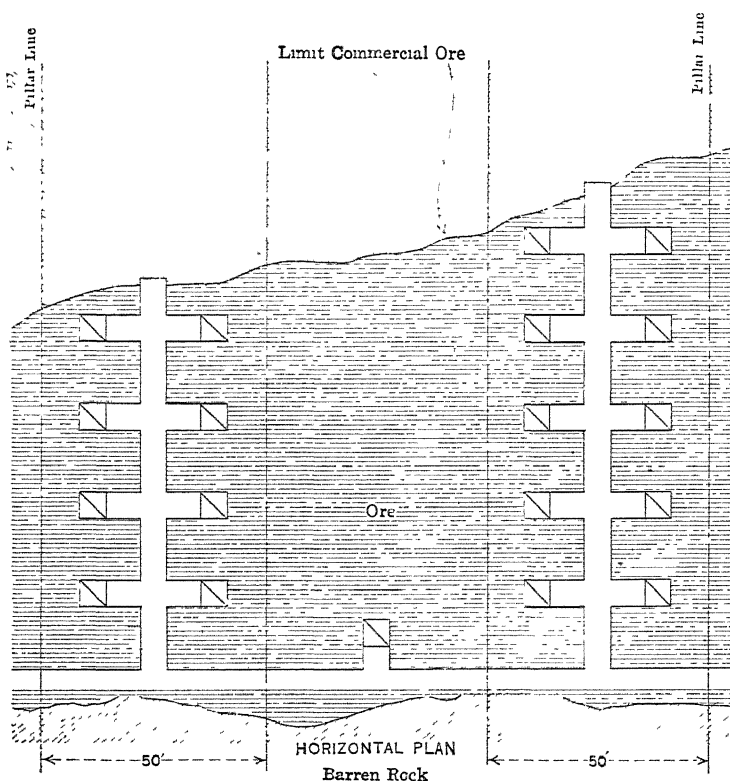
SHRINKAGE STOPE SHOWING SHOVELWAYS.
